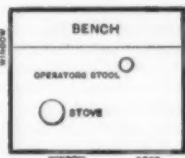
Floor Plan of a Wireless Telegraph Station.
